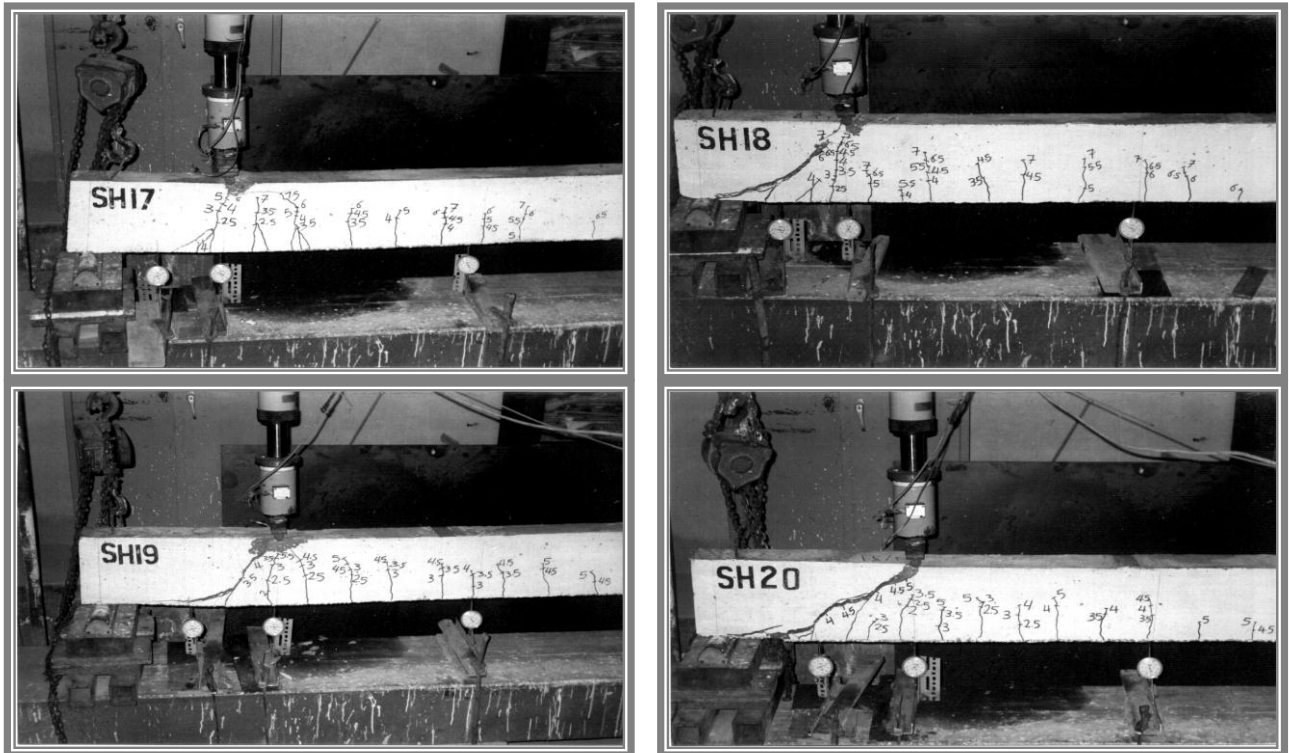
Cracking patterns after failure for tested high strength concrete beams without stirrups in group "H3".
